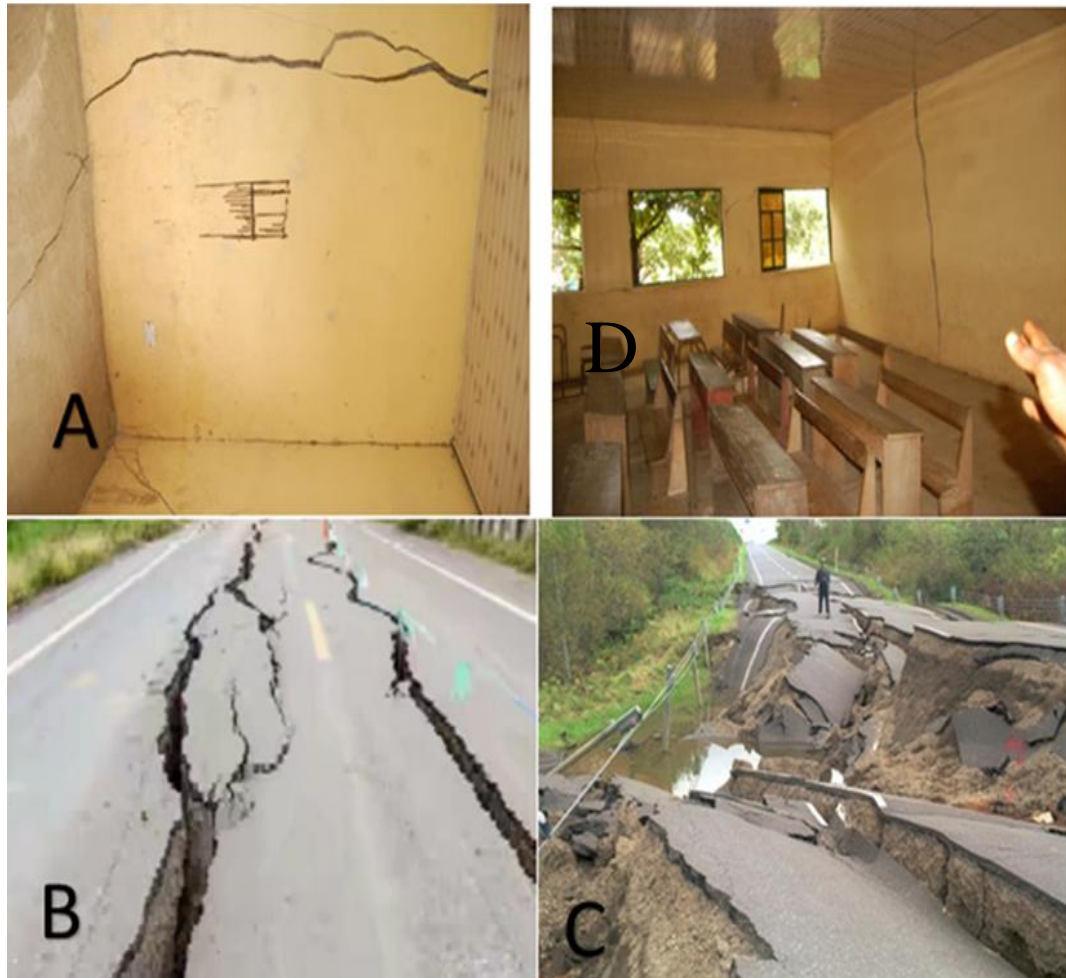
(A & D) Wall cracks in Tombia primary school building (B) Road crack caused by earth tremor in Igbogene major road. (C) Road crack caused by earth tremor in Ikarama, Okordia clan, Bayelsa state.
